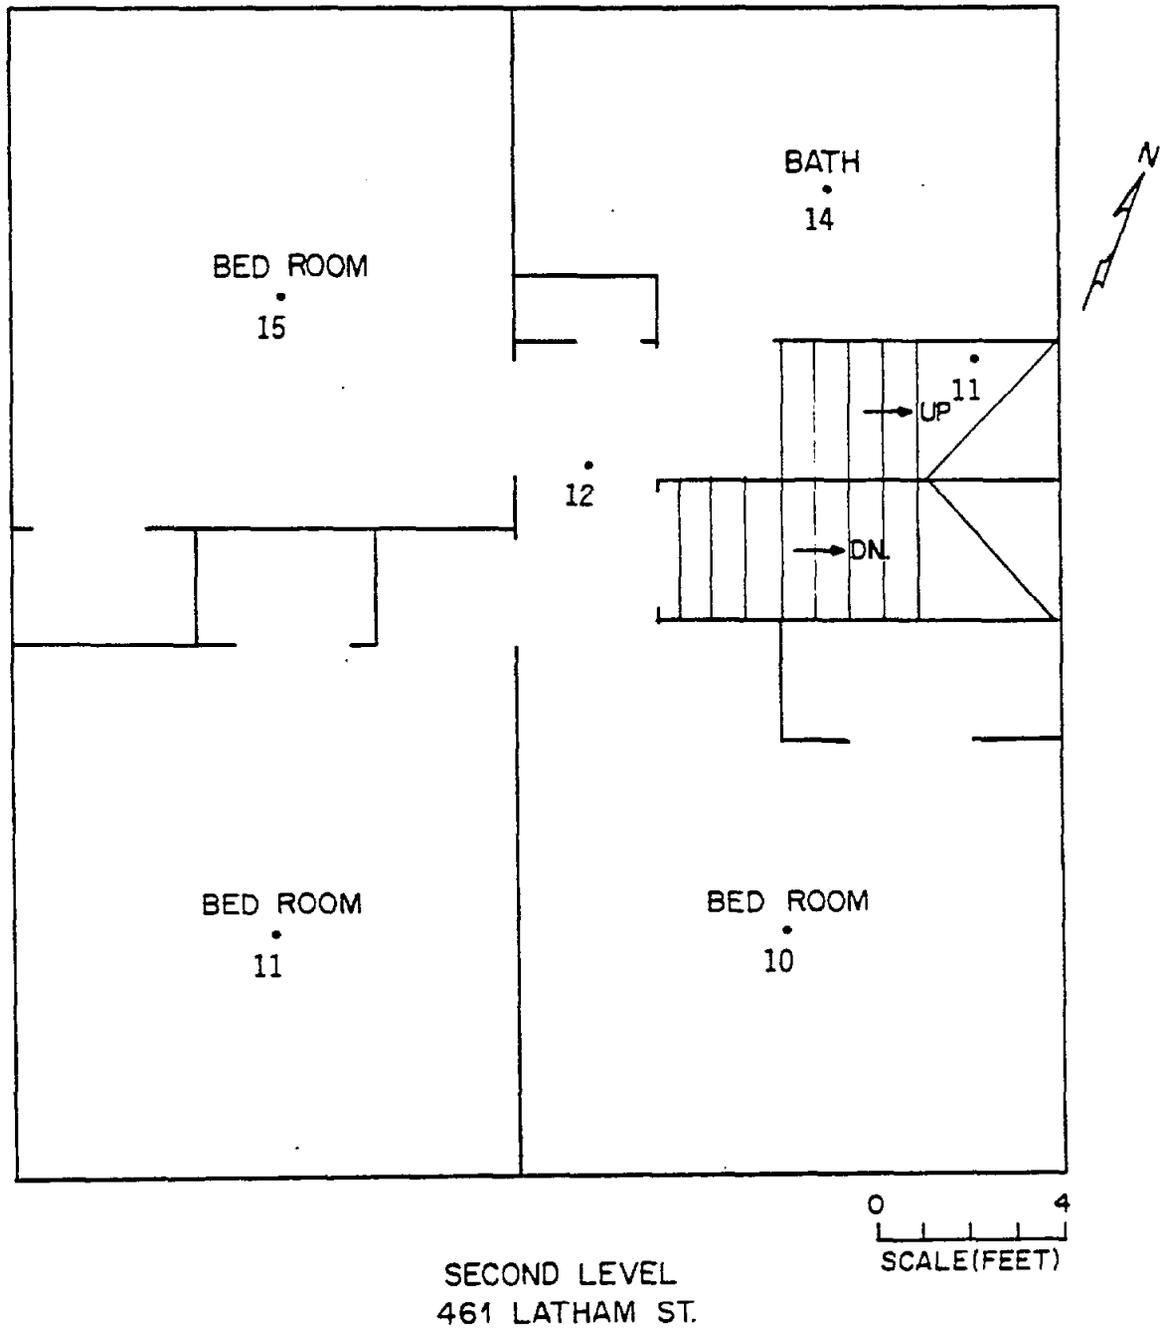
Schematic of the second level floor plan at 461 Latham Street
